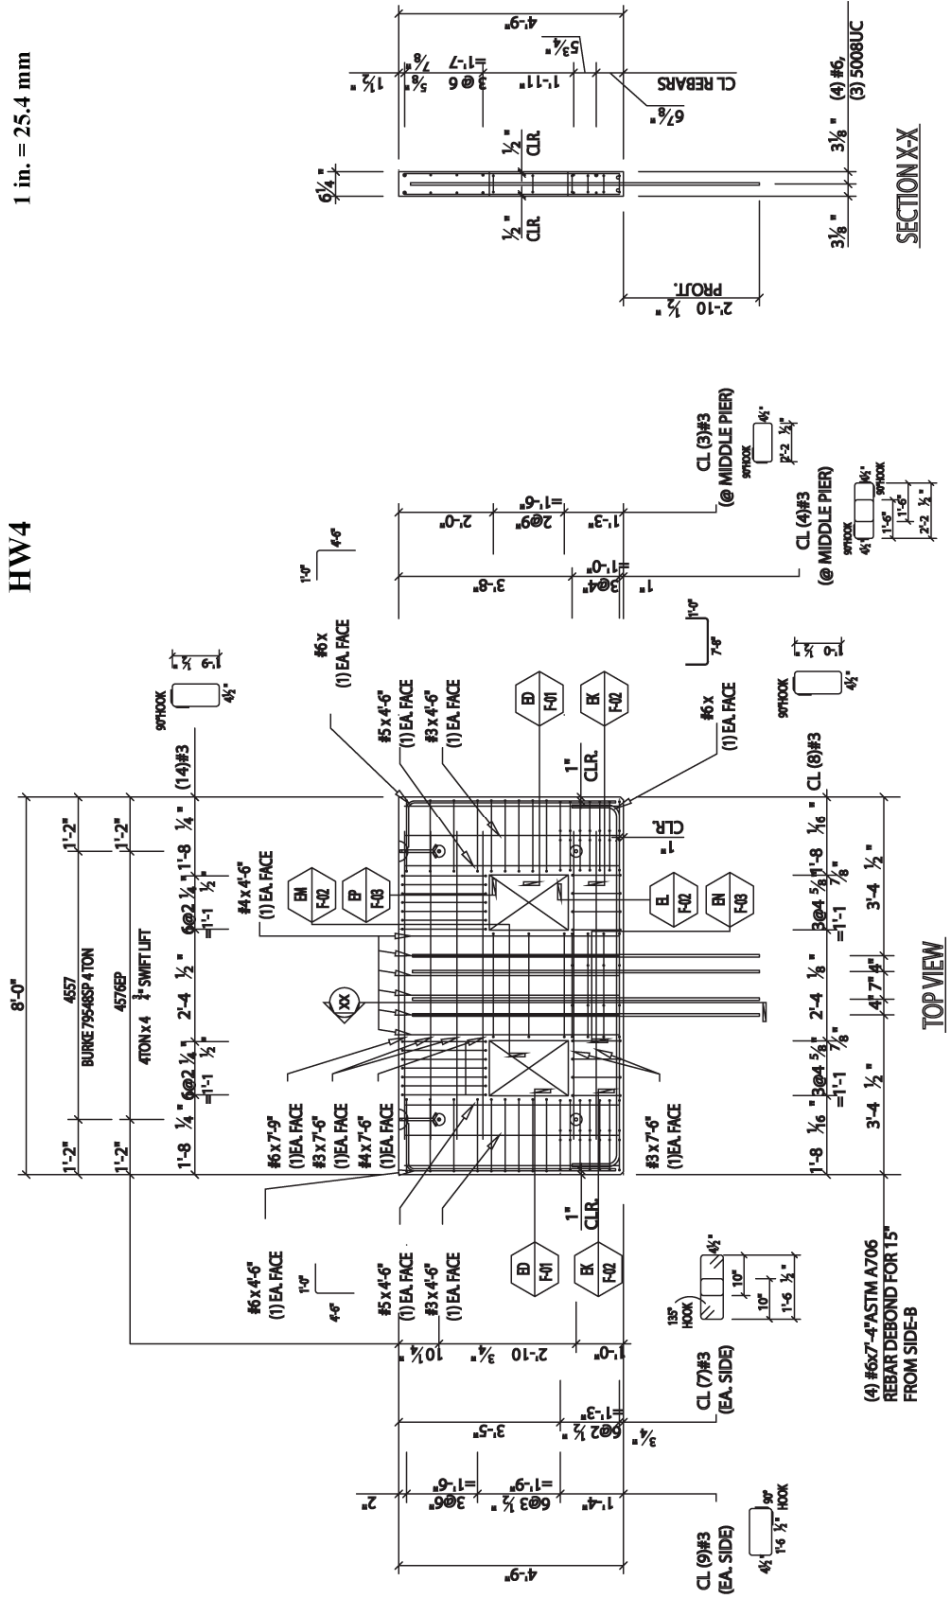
Base Panel Details for Specimen HW4 (Elevation View, Courtesy of the Consulting Engineers Group, Inc., Texas, USA)
